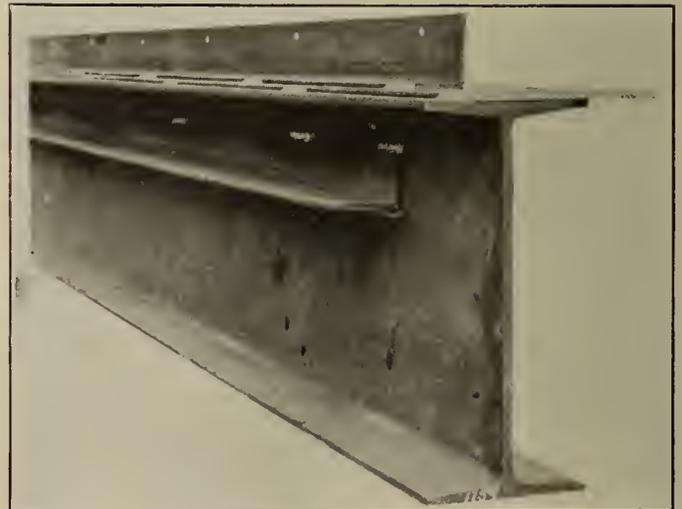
Method of Fastening Shelf Support for Brick Walls to Spandrel Beam.
